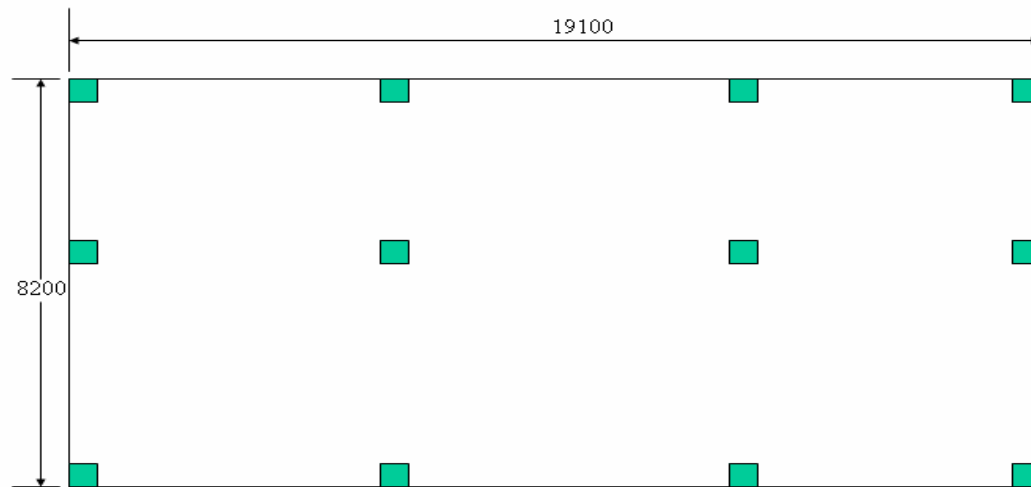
Slab/beam and LSI for cast in-situ column with flat plate and perimeter beams
